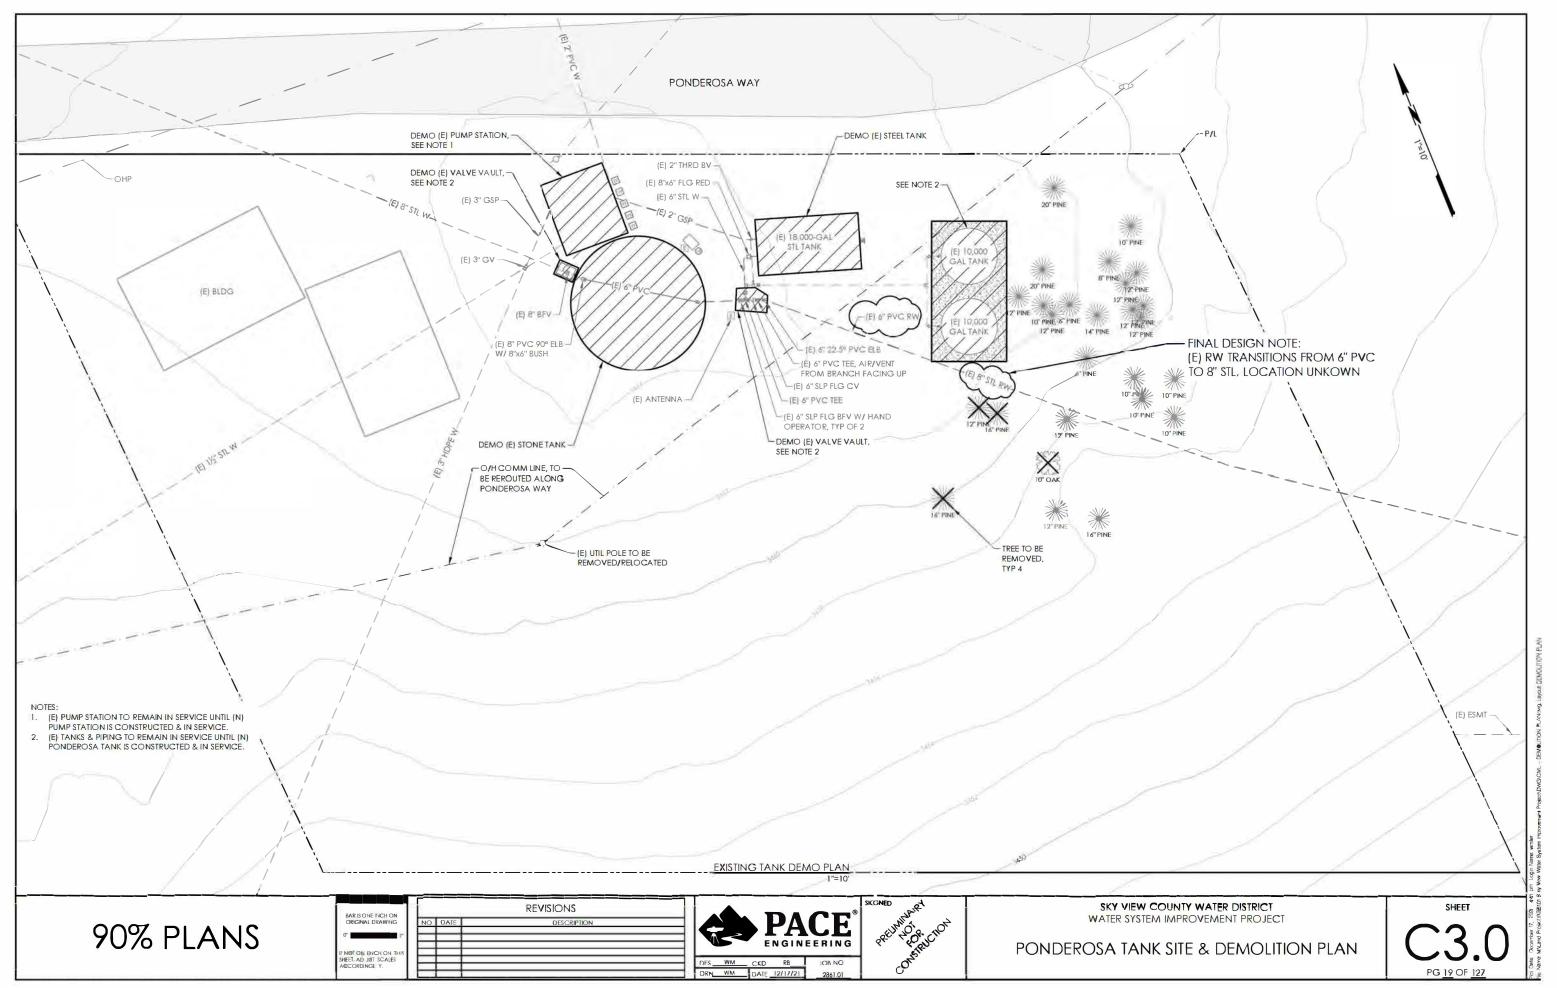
Ponderosa Way Tank Site - Demolition Plan
